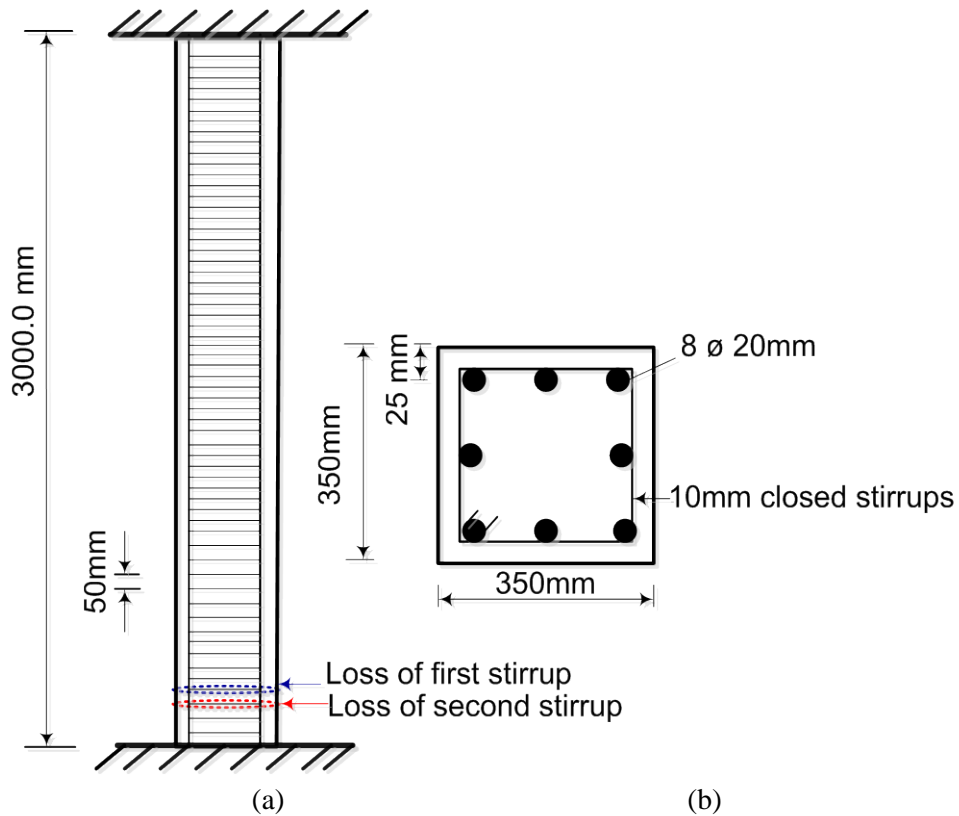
RC column under axial load and moment and subjected to reinforcement corrosion (case study 2.6.4): (a) column details; (b) cross-sectional details.
